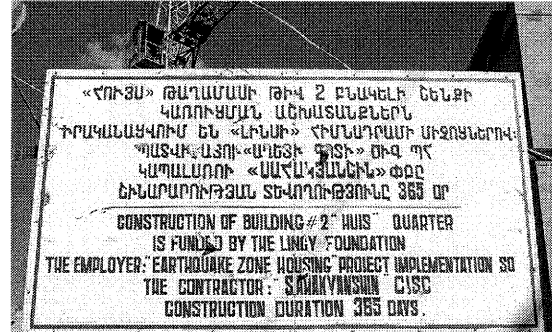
A new construction site in Gyumri. The panel indicates as Earthquake Zone Housing Project.
